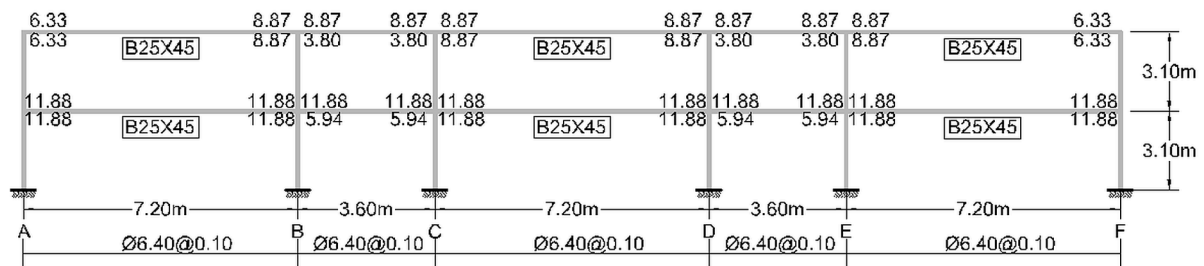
Educational facility, geometry and reinforcement in columns of the Frame 2
